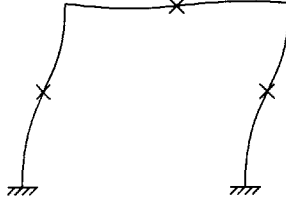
Assumed deformed shape of columns and beams (crosses mark the inflection points)
